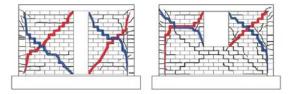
Failure modes in the confined masonry walls with openings^{δ}
